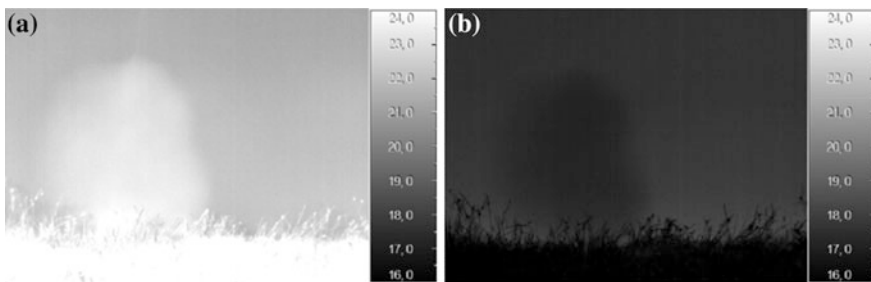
Detachments observed with sunlight falling on the façade at: a 4.30 pm and b 11.30 pm
